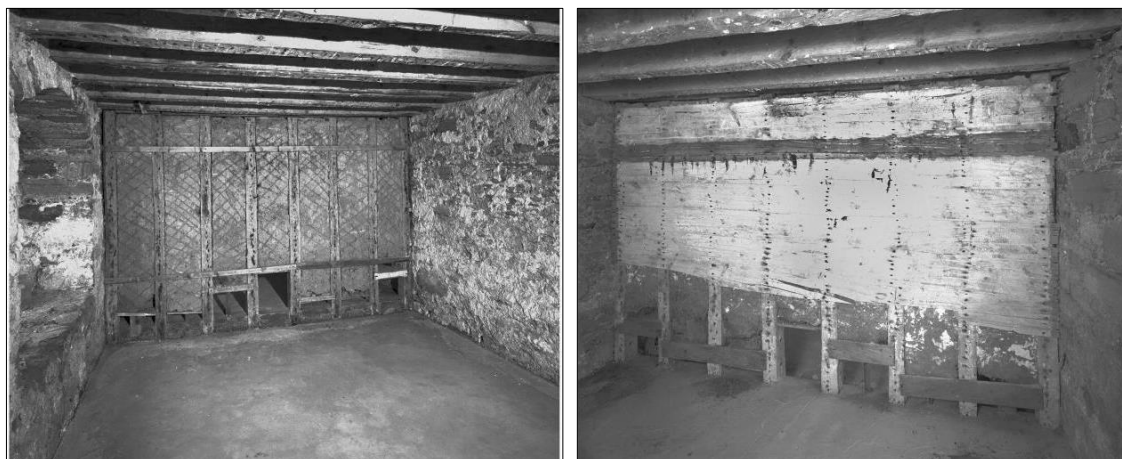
Stake and mud dividing wall in Foulis Castle, near Evanton, Highland. (© SCRAN).
